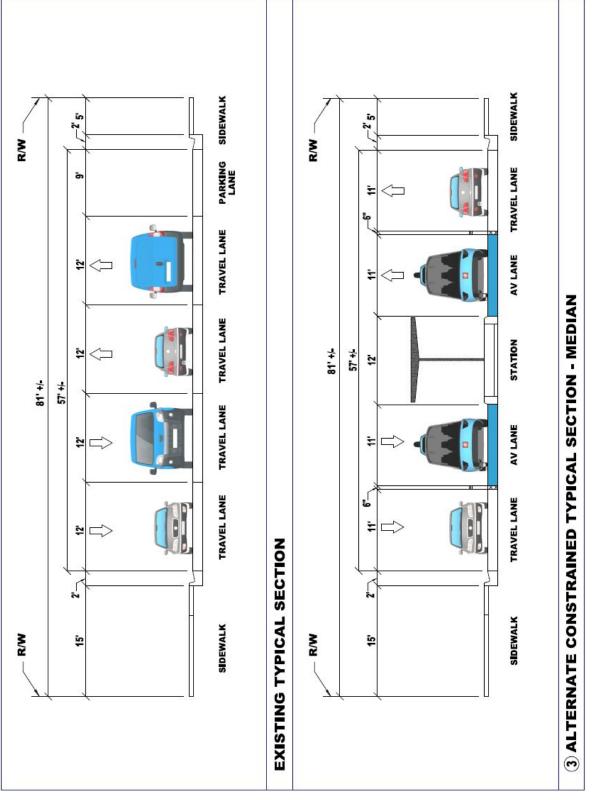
West Corridor Existing and Alternate Constrained Typical Section with Median Station - Park
